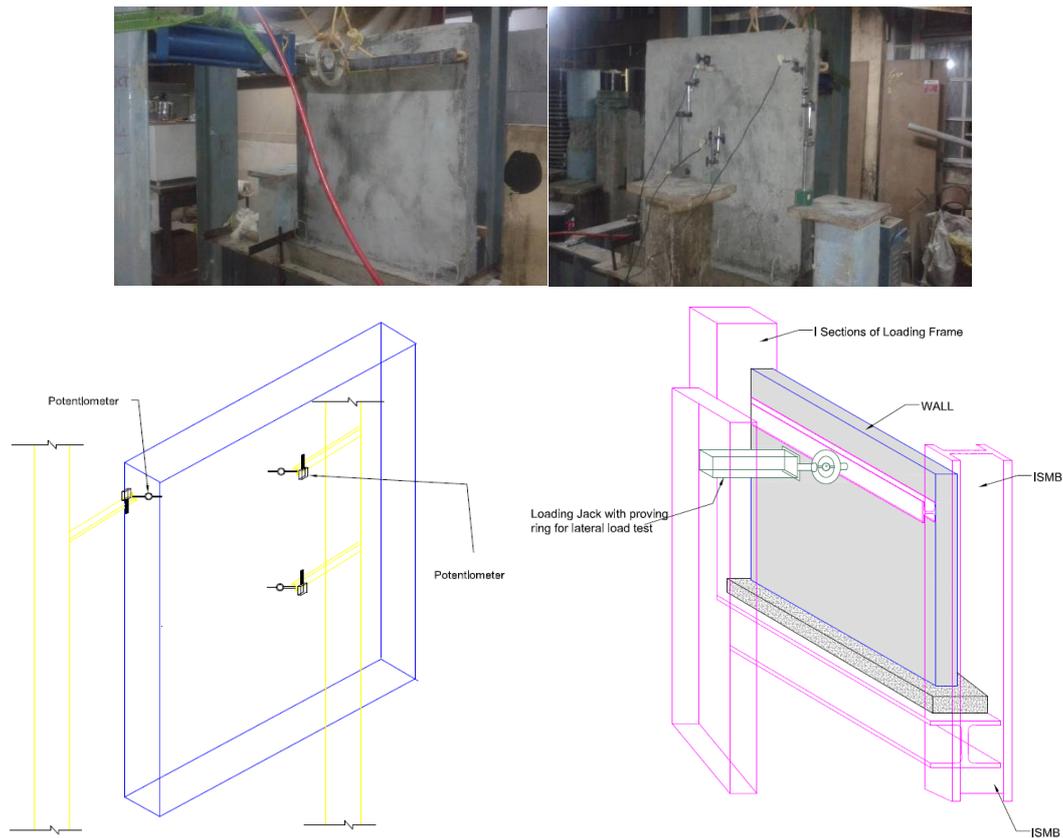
Assembly setup for lateral load test showing loading arrangement and placement of linear potentiometer
